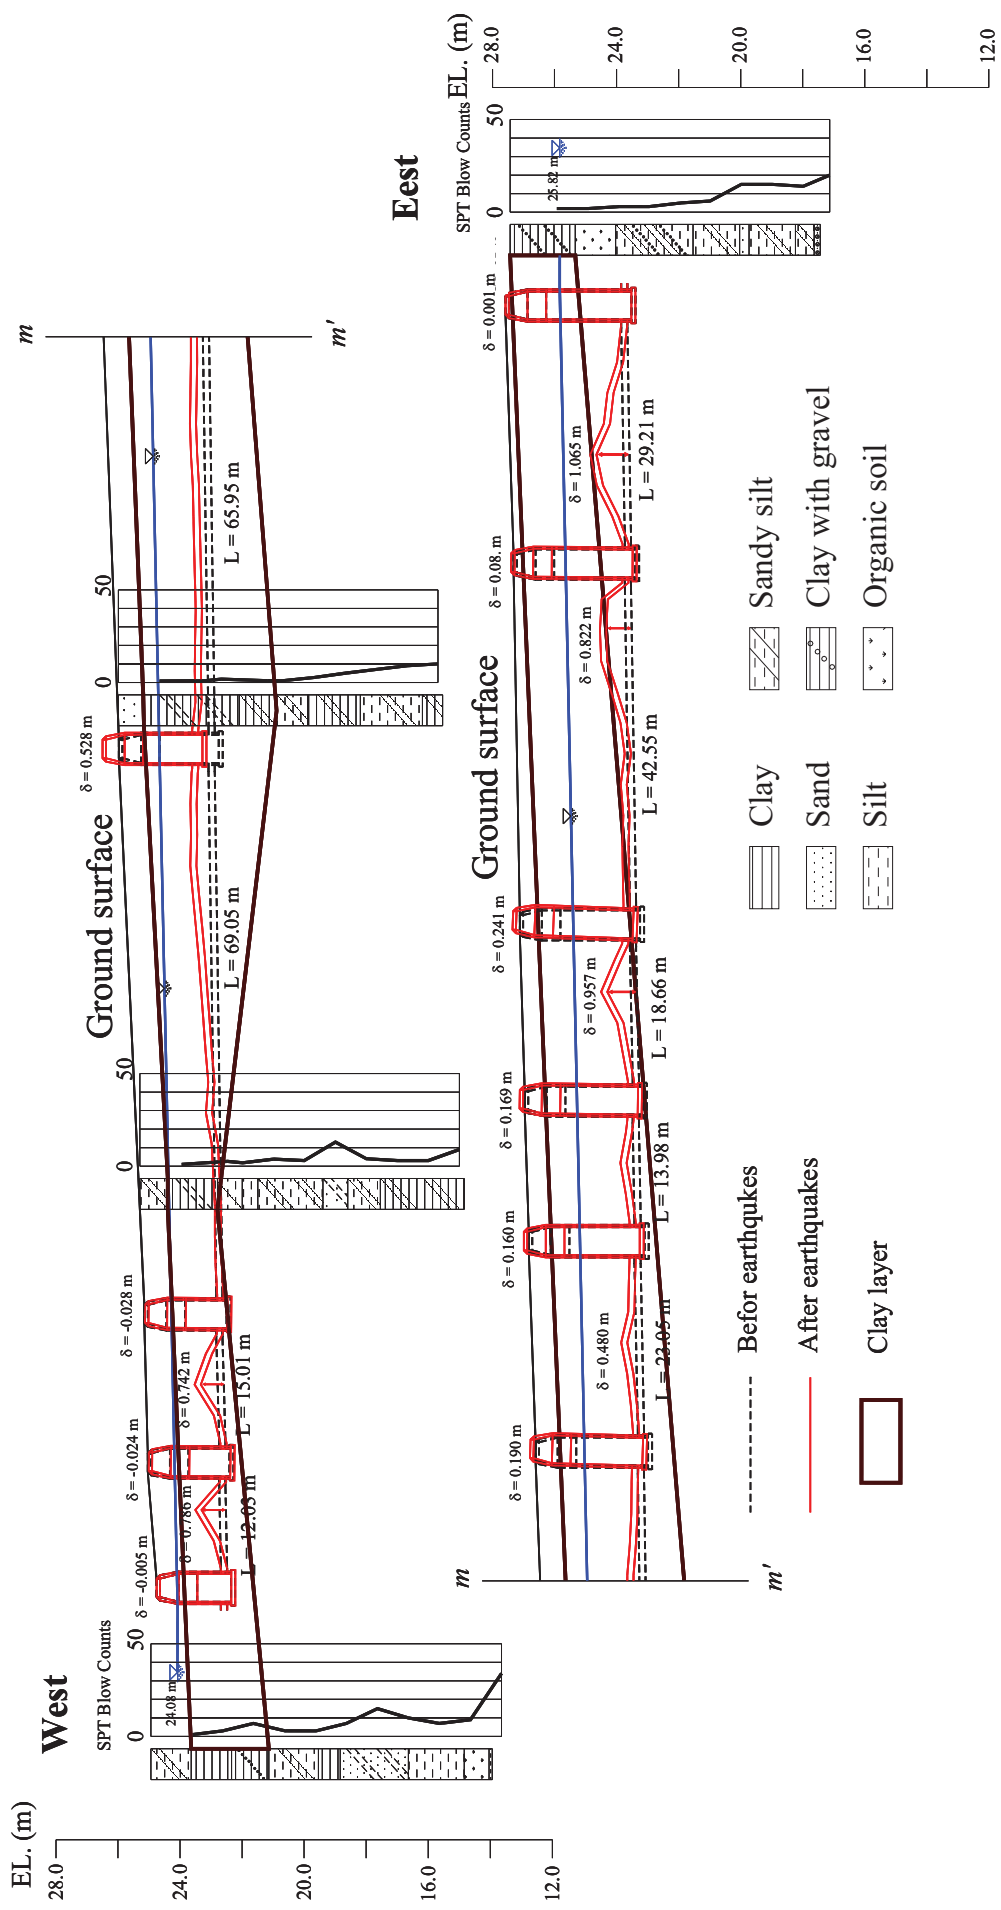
Cross section of damaged manhole and pipelines shown in Zone 2.
